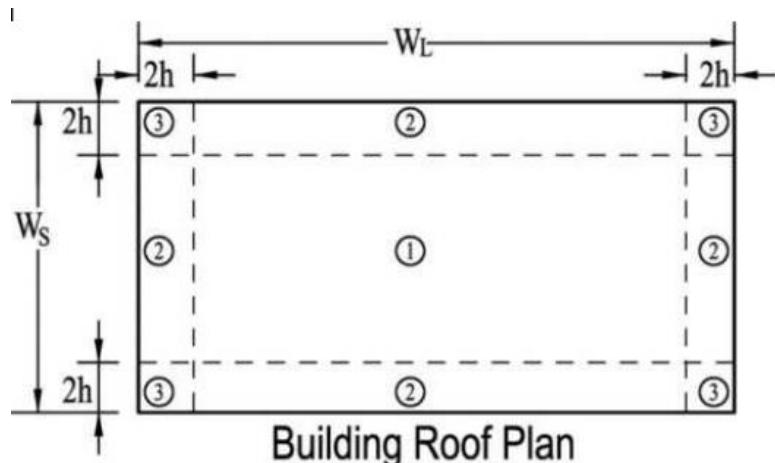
ASCE 7-16 Figure 29.4-7 shows the Building Roof Plan defining the roof zones.
